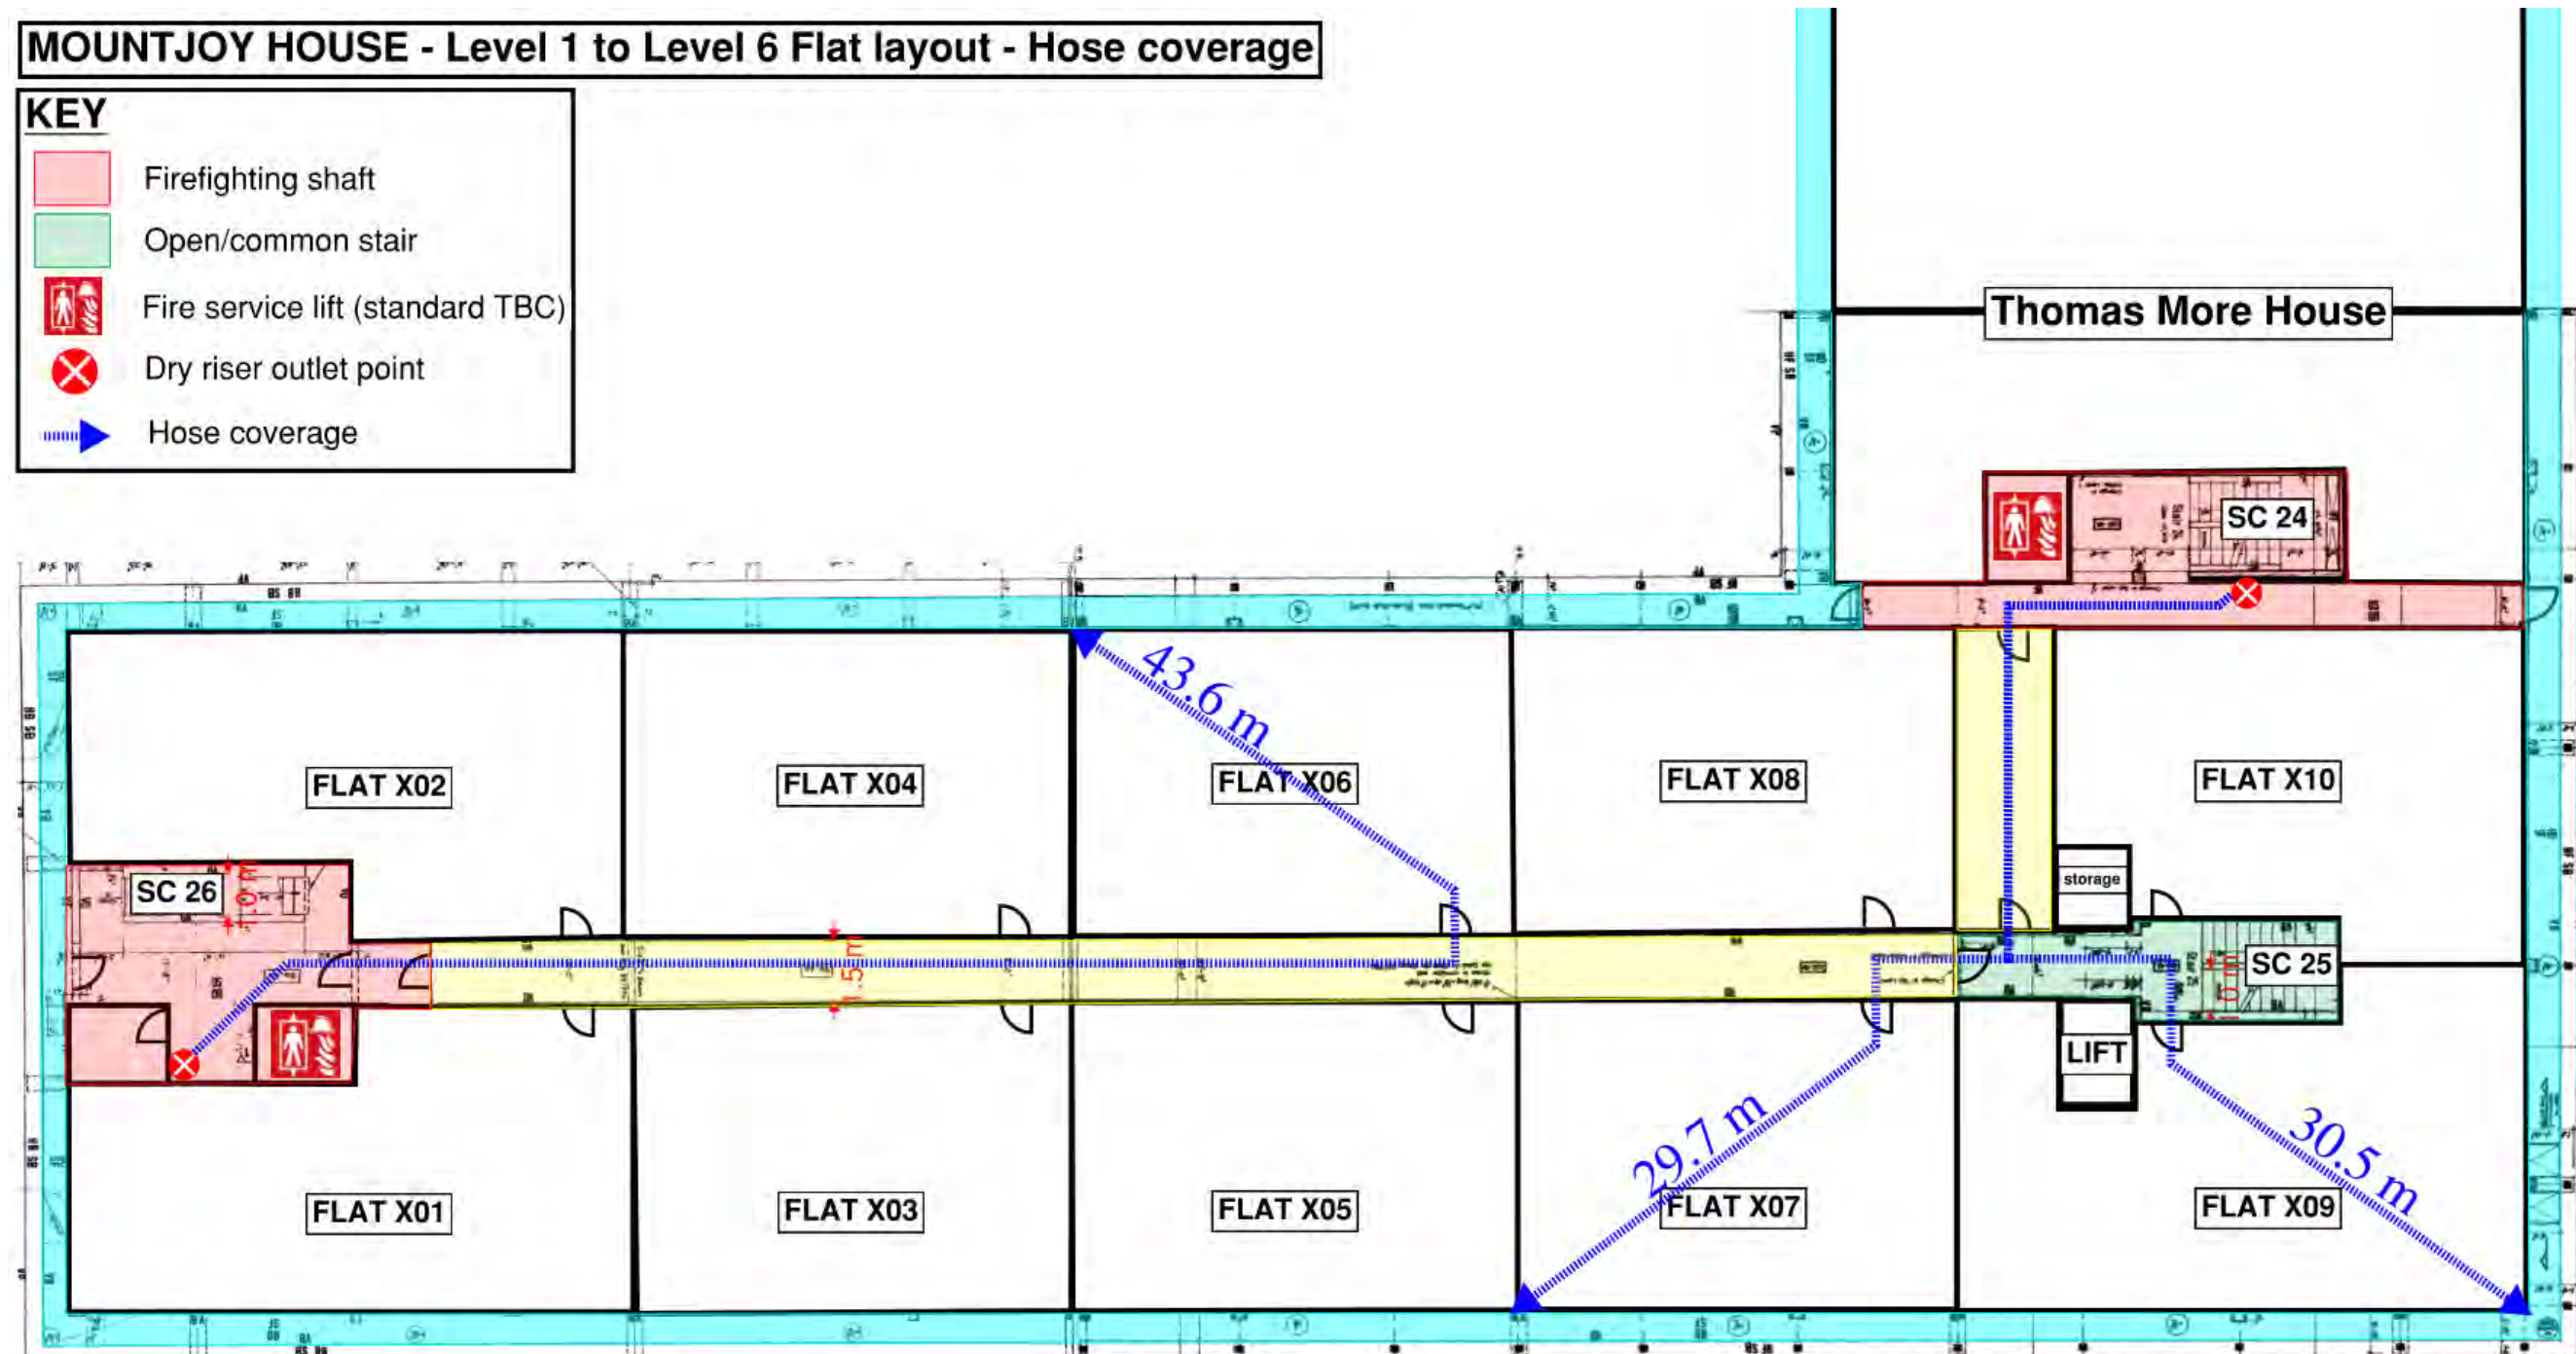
Firefighting facilities and access for Mountjoy House for typical residential level (L1 - L6)
